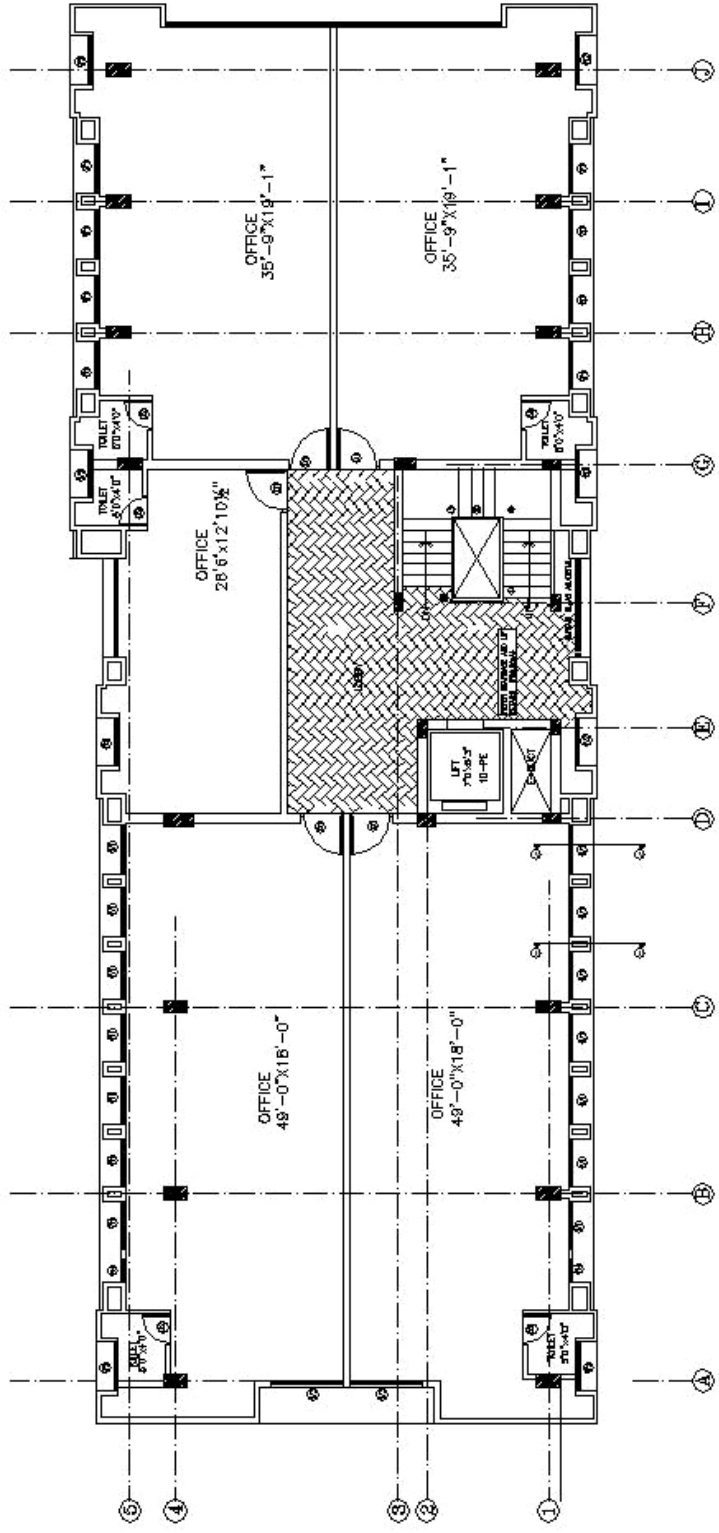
Mahavir Commercial Complex, Hyderabad: Third Floor Plan
